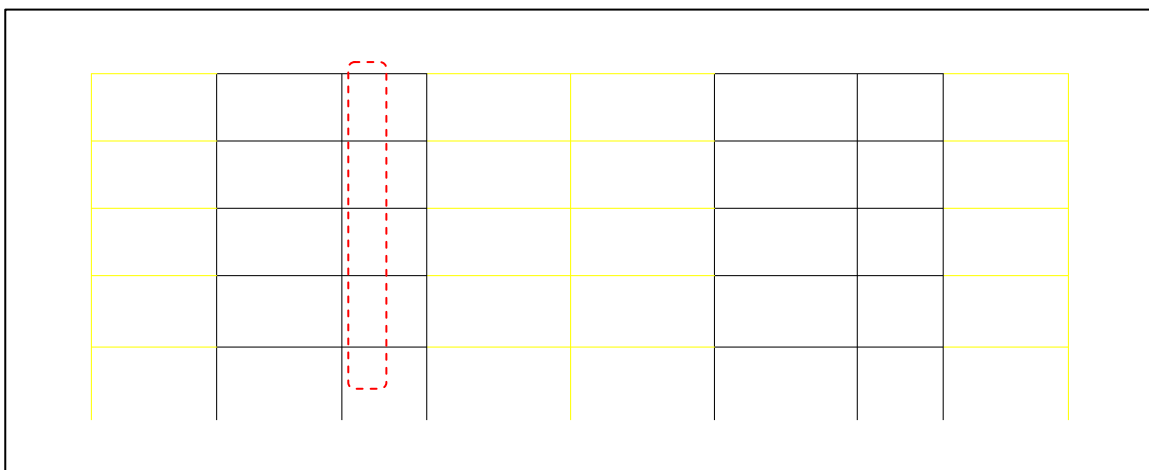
MF-1 Frame Elevations with Marked Beams
